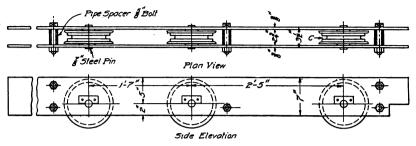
Plan and Side Elevation of Sheave Bars for Basement Elevators
